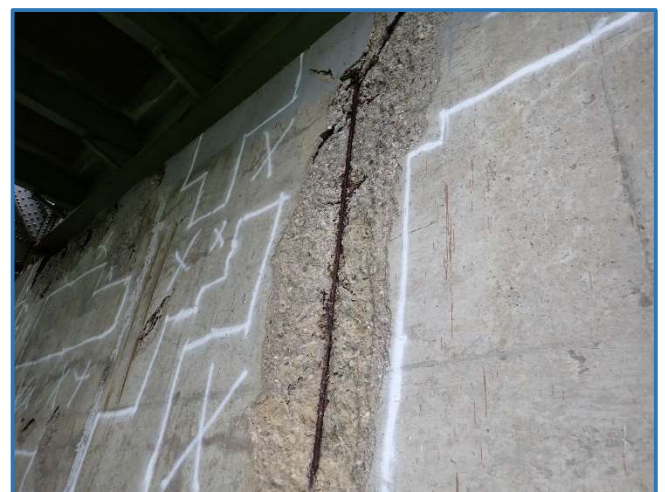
Spall in west face of Pier 4, under Stringer 4 with exposed, debonded rebar
